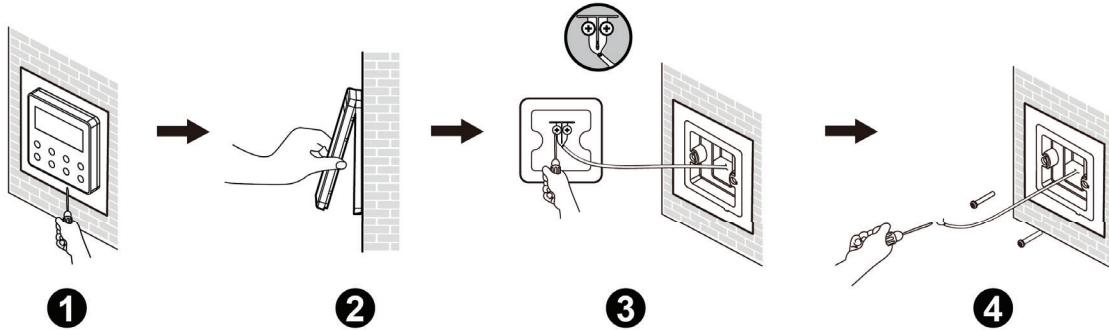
Sketch Map for Disassembly of Wired Controller
